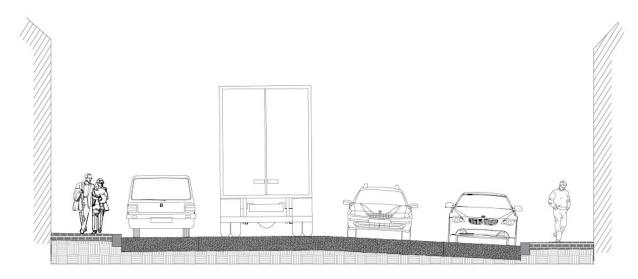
Typical Proposed Cross Section – N51 Main Street West (Section at Ch. 180)
